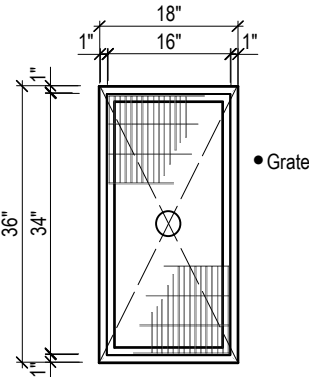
DETAIL DRAWING			D.D.No:	Item: WALKIN BOX - Cooler/Freezer			No: 1 & 4
